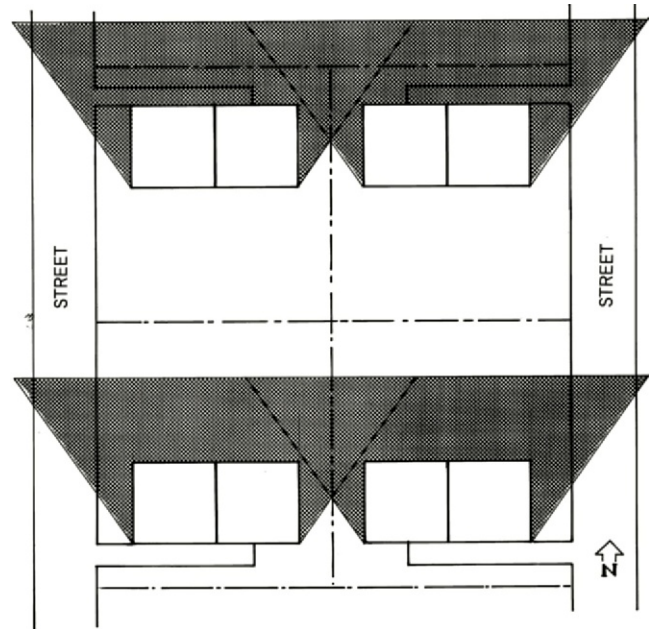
Even on diagonal streets, buildings can be oriented toward the south.
